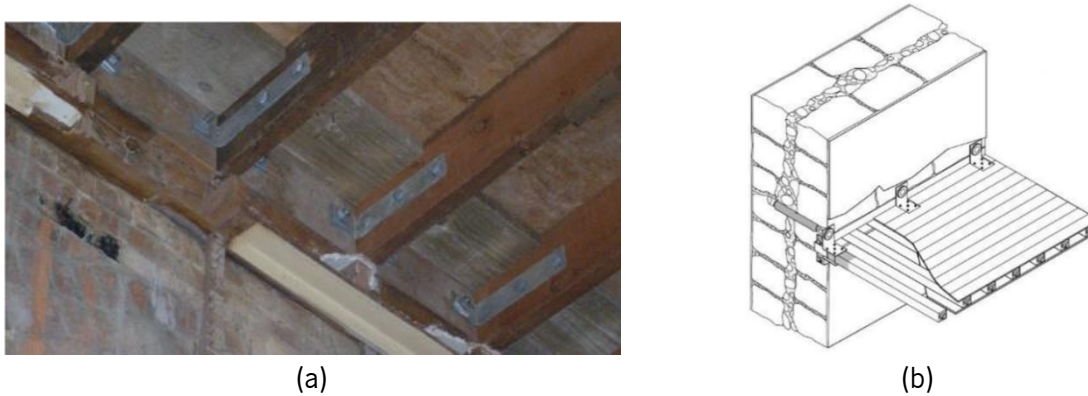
Wall-to-diaphragm bolt anchorages: steel rods bolted to steel angles (Blaikie and Spurr 1992); (b) Strengthening solution with injected anchors proposed for Pombalino buildings (Cóias 2007).
